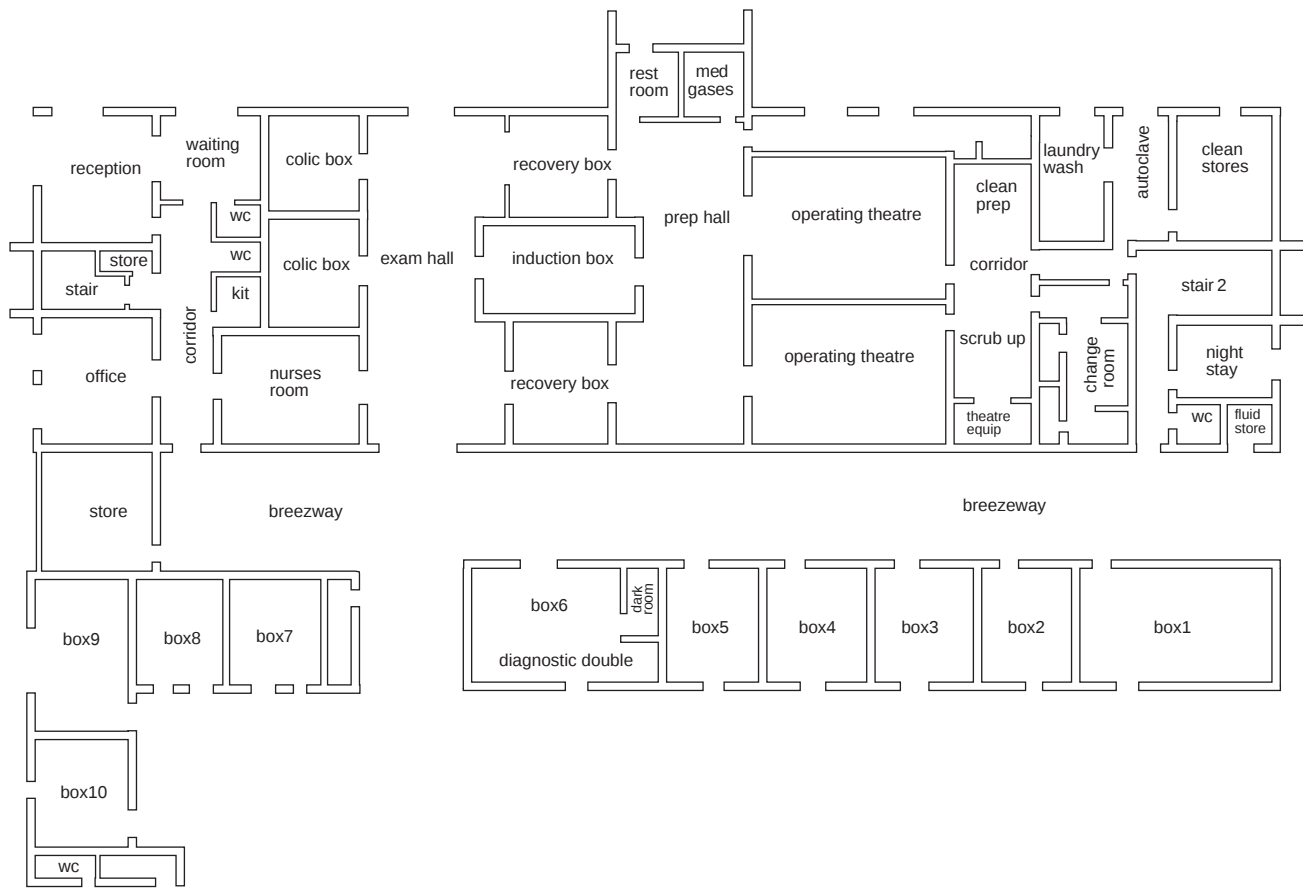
Architectural plan for the ground floor level of Rosedale and Partners Hospital. Redrawing of original architectural plan for clarity. ©Tim Greet and Stephen Cahalan 2007.
